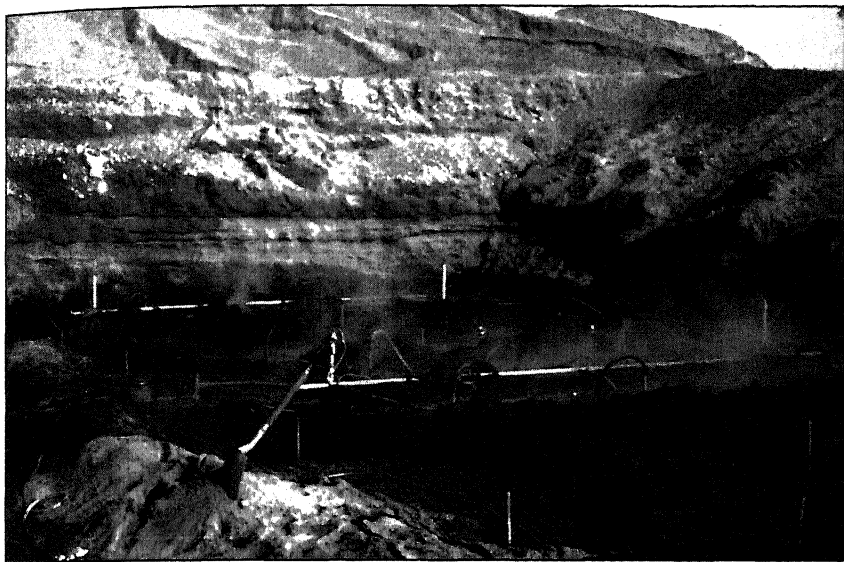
System of connected thaw pipes at West Valley High School, Fairbanks
